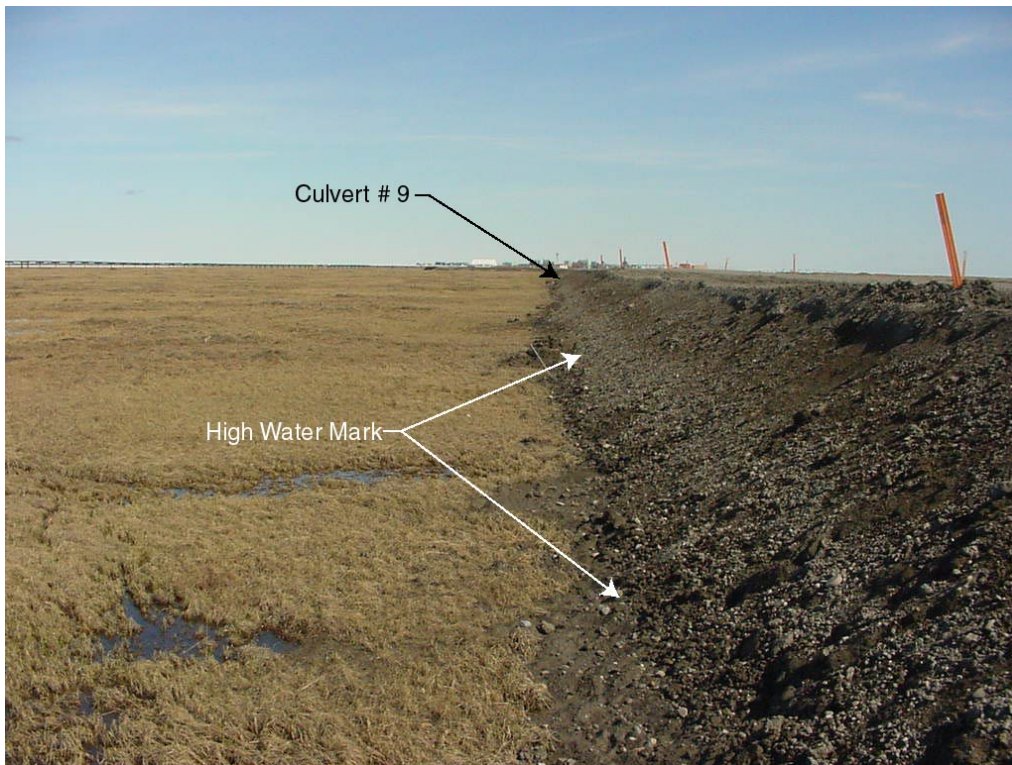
Facing east from Culvert #10 along the north side of the CD-2 access road. (6/15/01)
